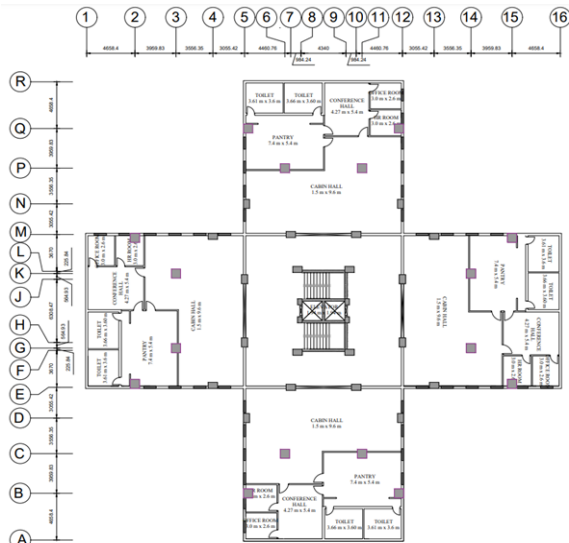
Odd level floor layout (G+3,5,7,9,11,13&15)
